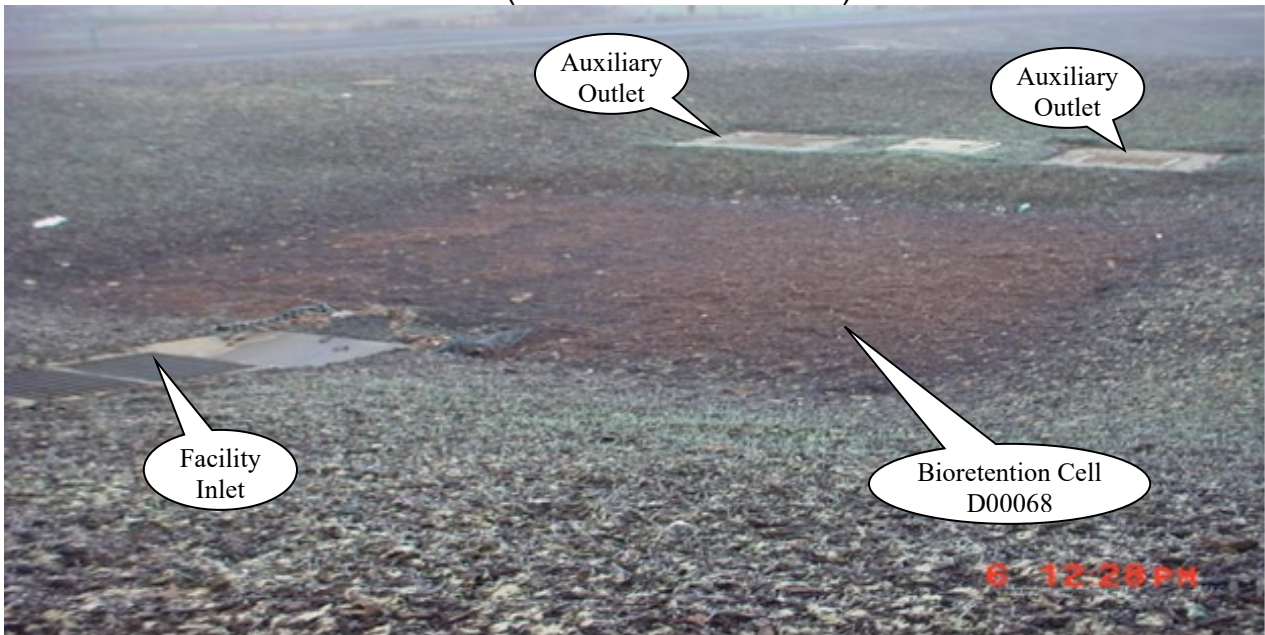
Facility Footprint (b) Looking North or Downstream (Taken December 2011)
